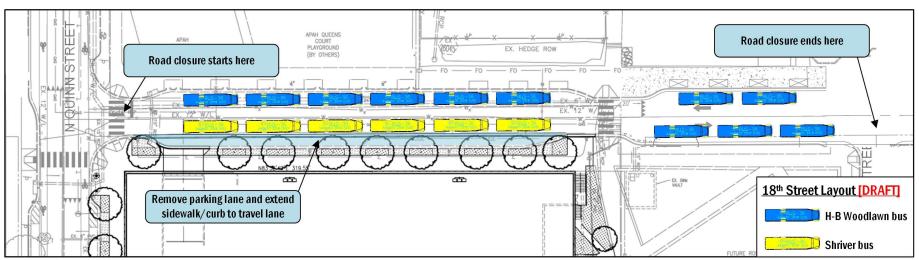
Proposed Streetscape Improvements along 18th Street – DRAFT
